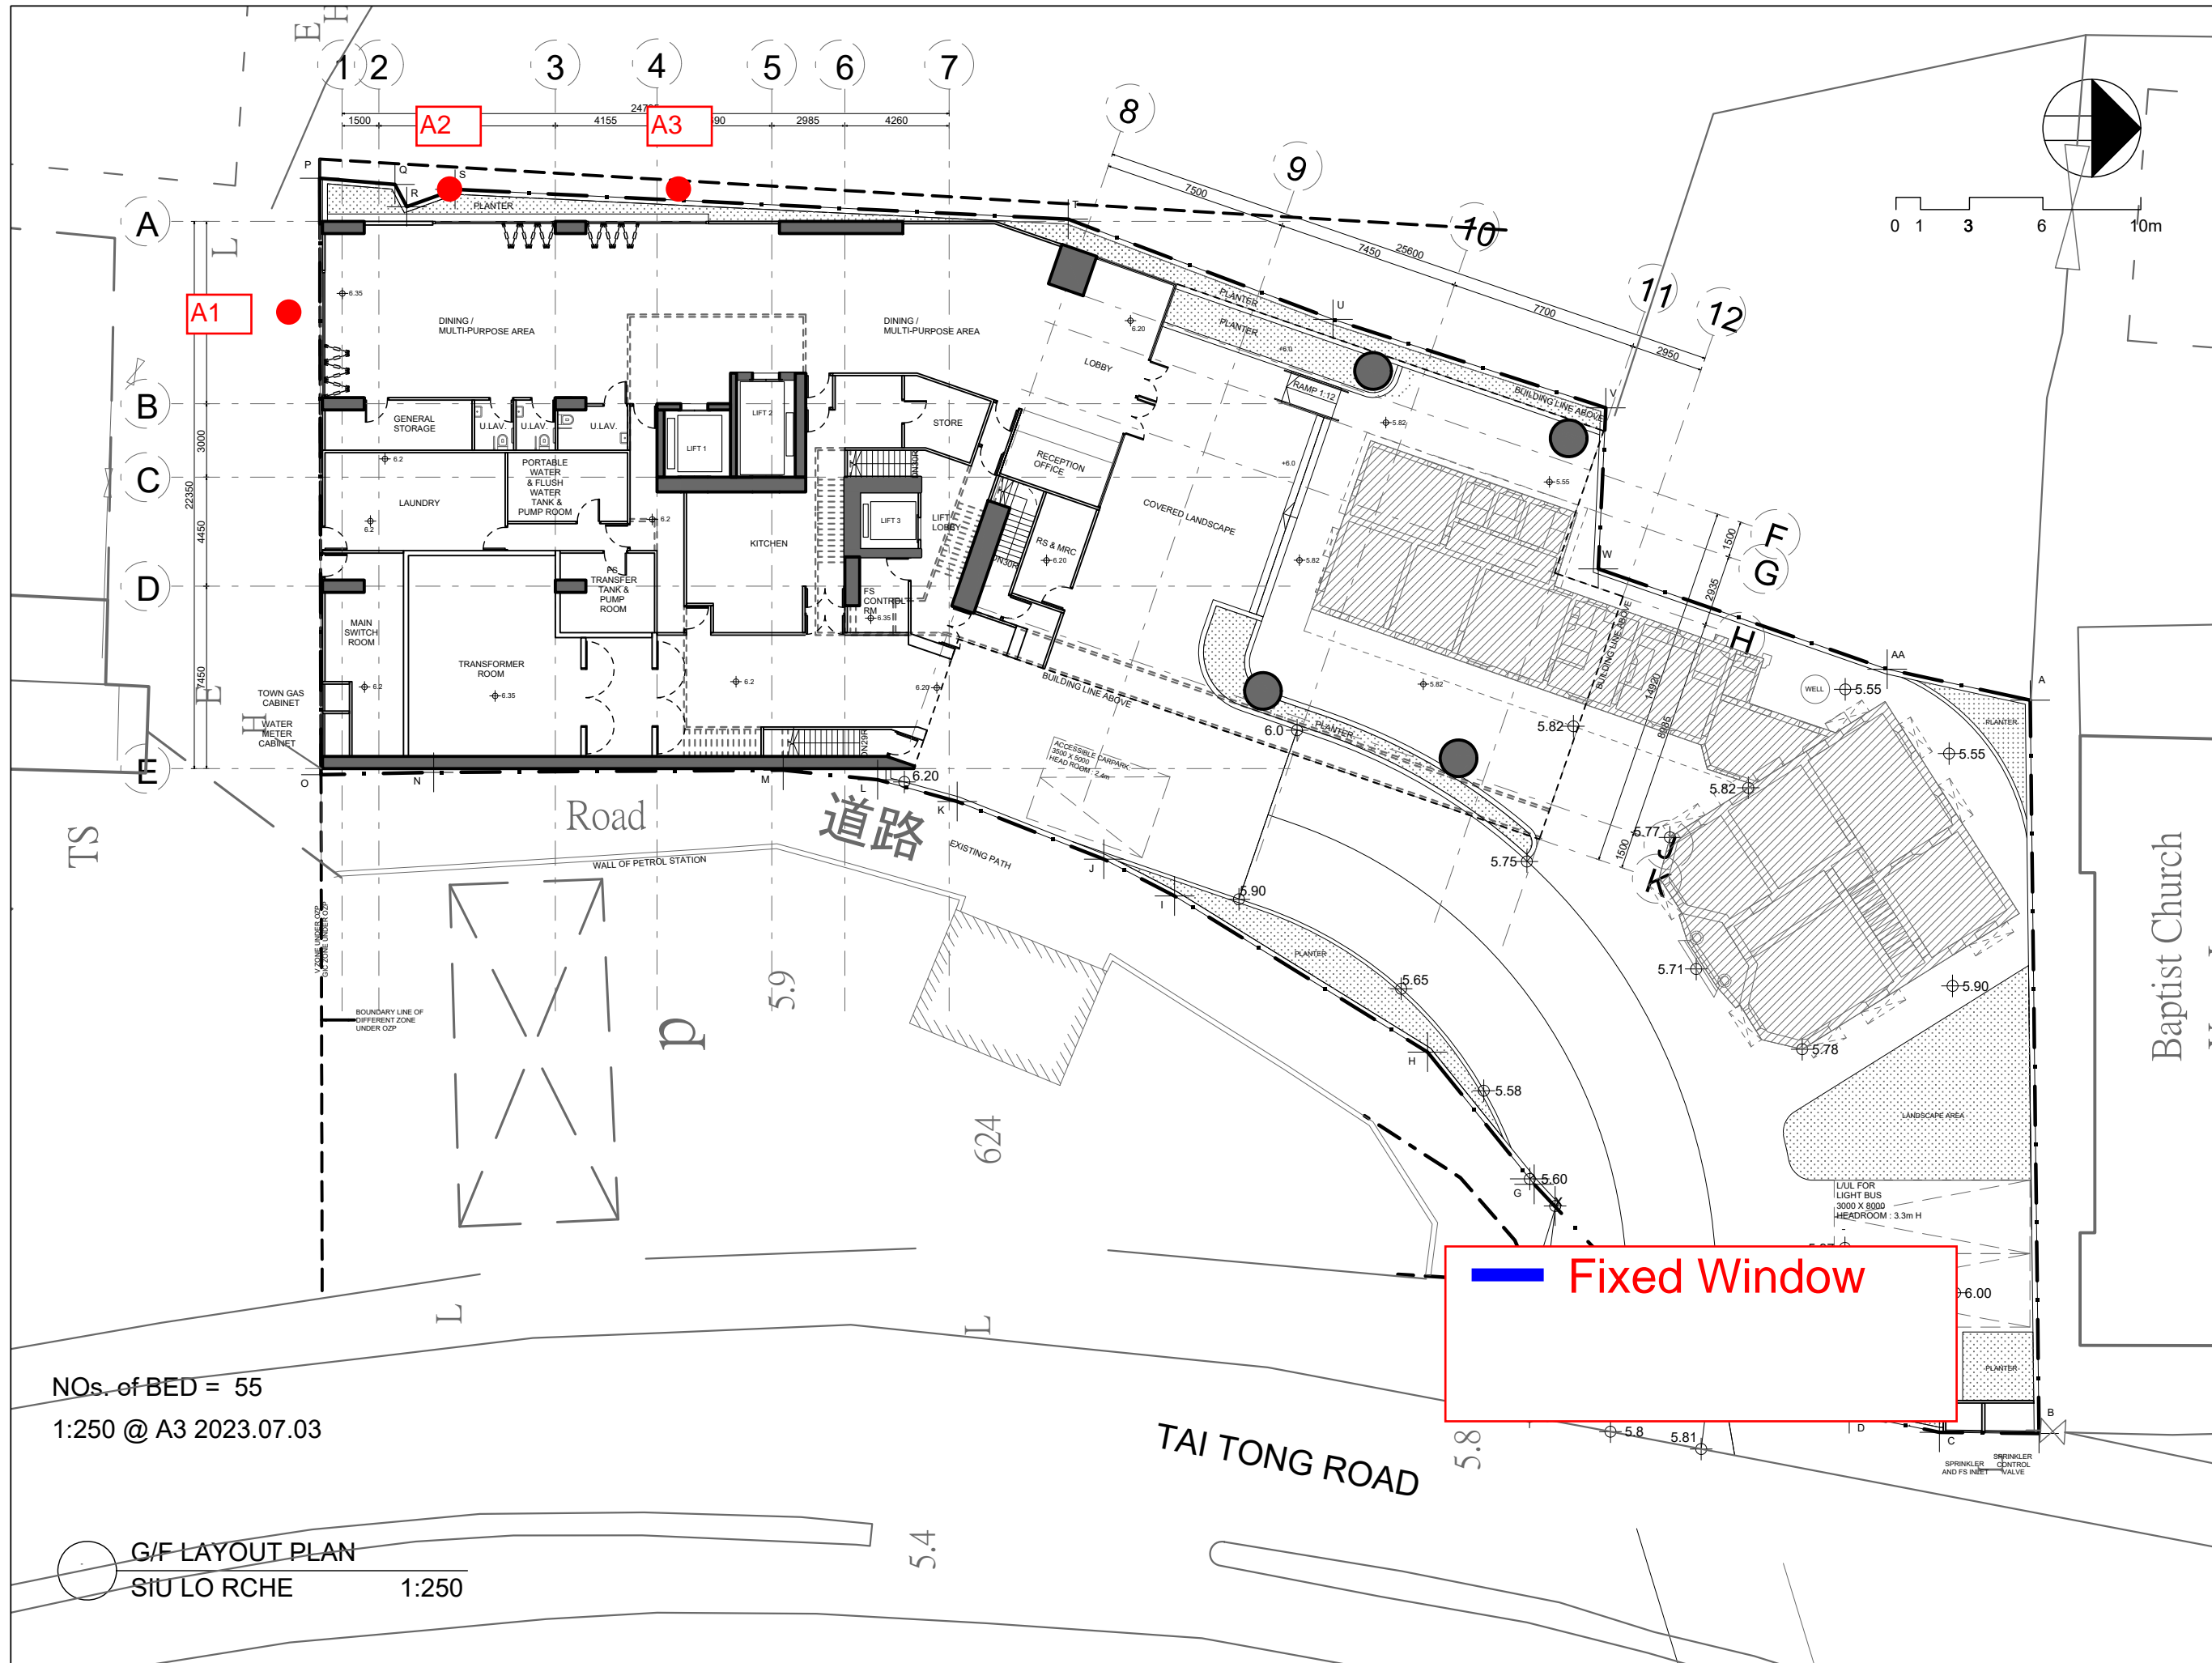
Proposed uses and works in Siu Lo – Ground Floor.
